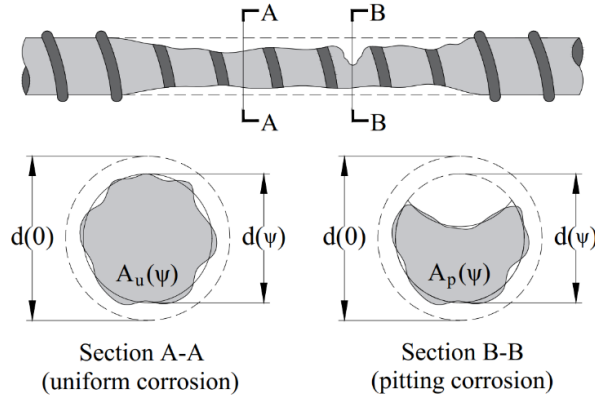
Uniform and pitting corrosion on a single steel rebar scheme.
